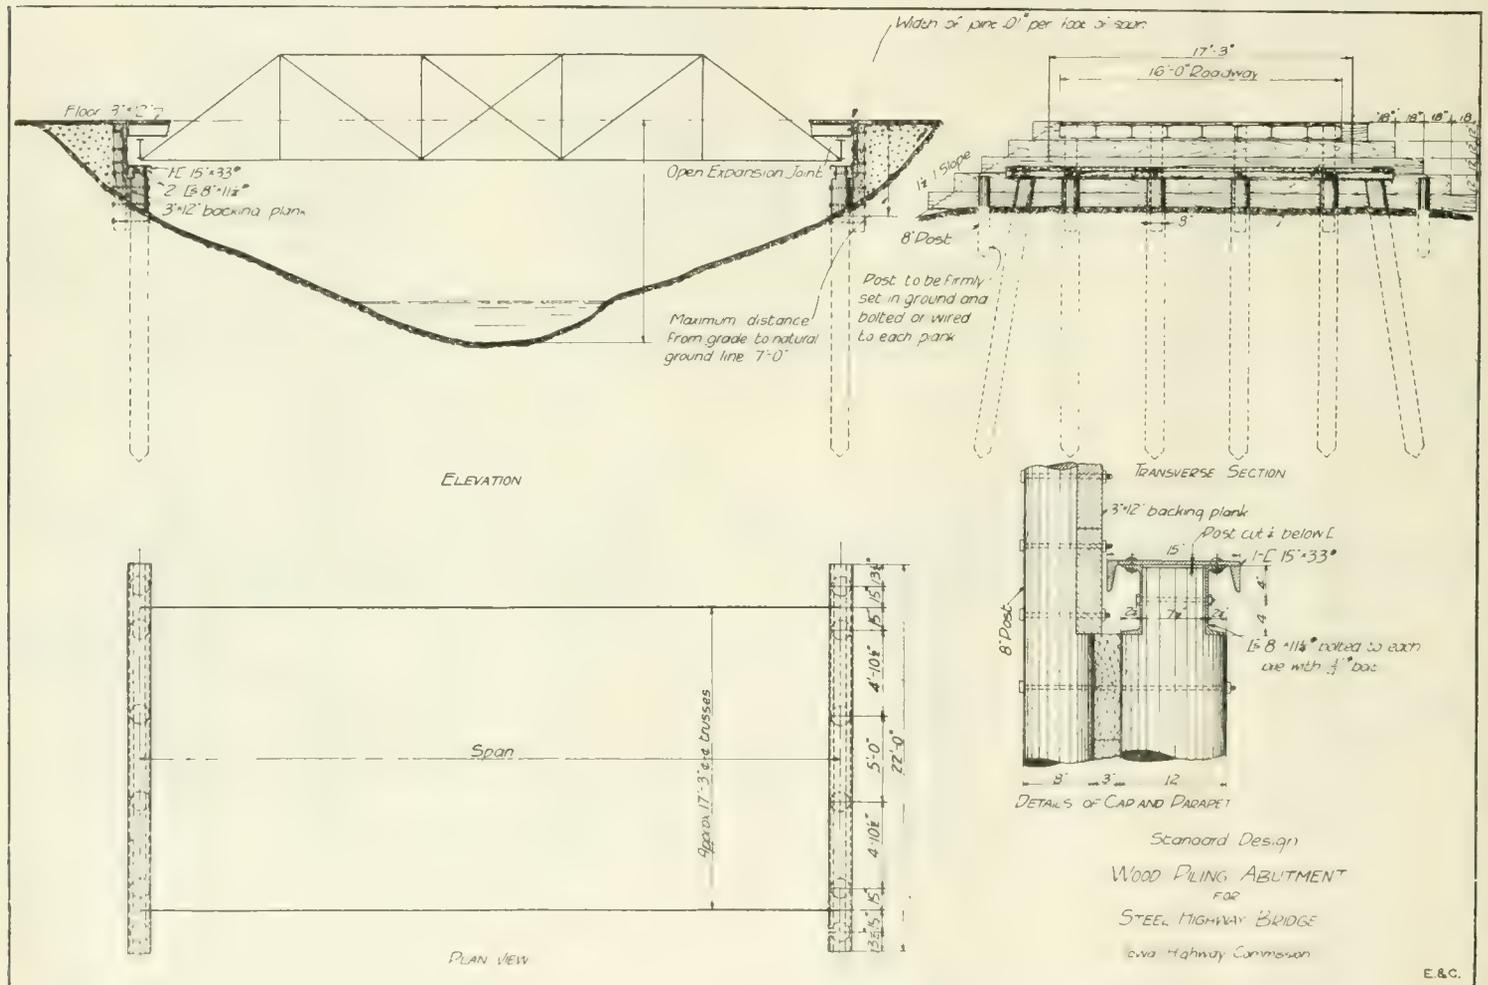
Standard Wood Piling Abutment for Steel Highway Bridge of the Iowa State Highway Commission.
